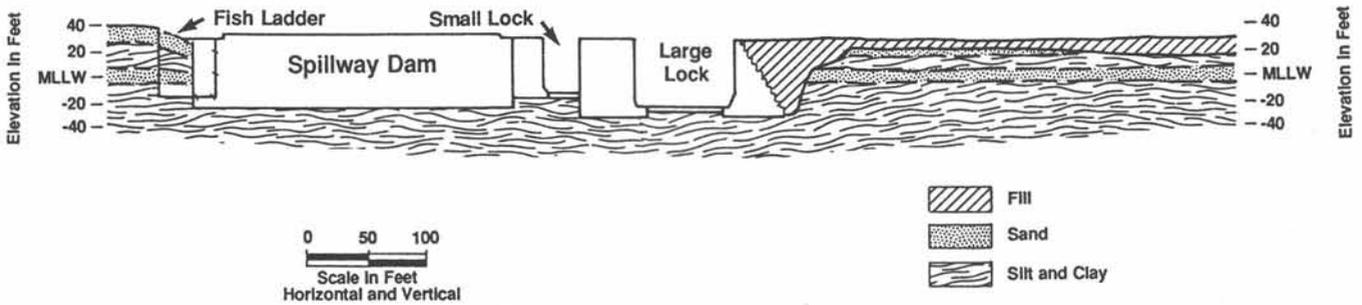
Geologic section through Chittenden Dam and Locks on the Lake Washington Ship Canal. View northwest (downstream) toward Shilshole Bay.
